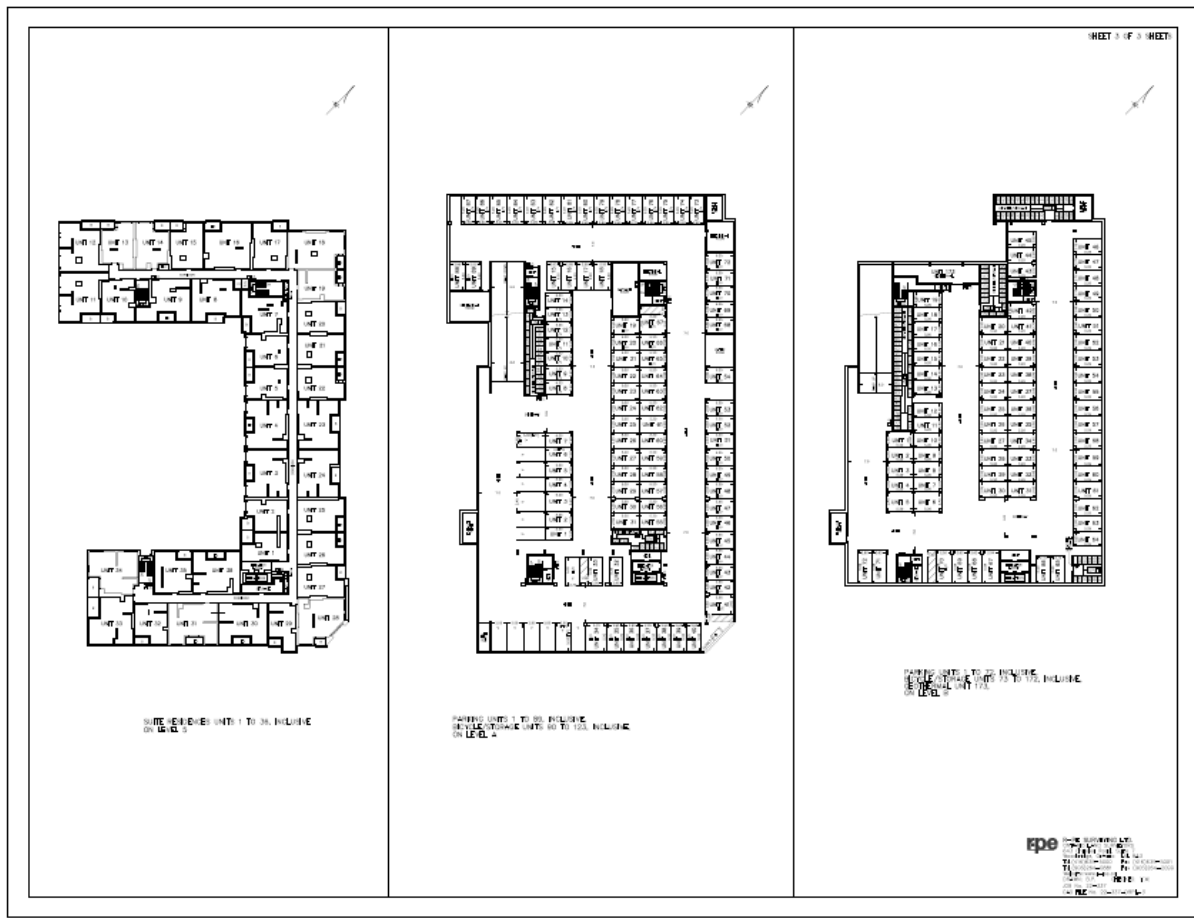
Draft Plan of Condominium Level 5 and Underground Parking
